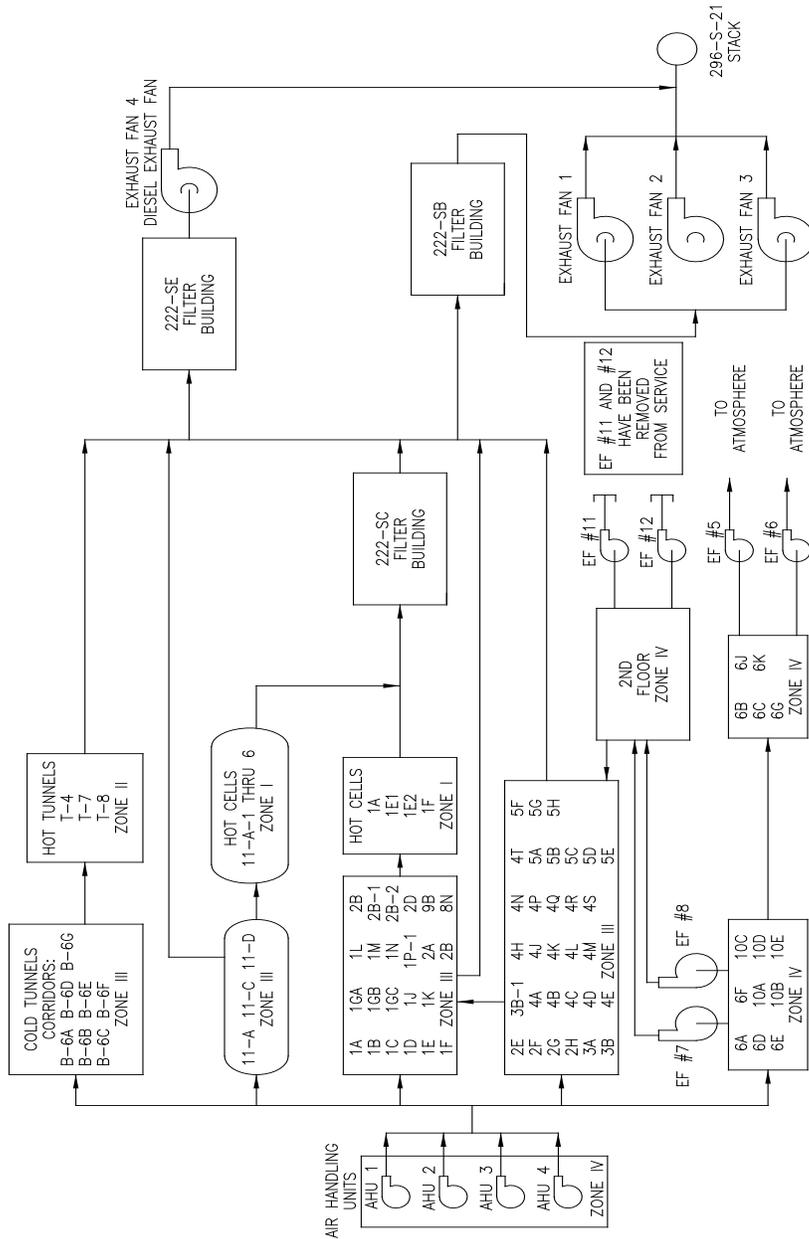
222-S LABORATORY BUILDING VENTILATION SYSTEM.
